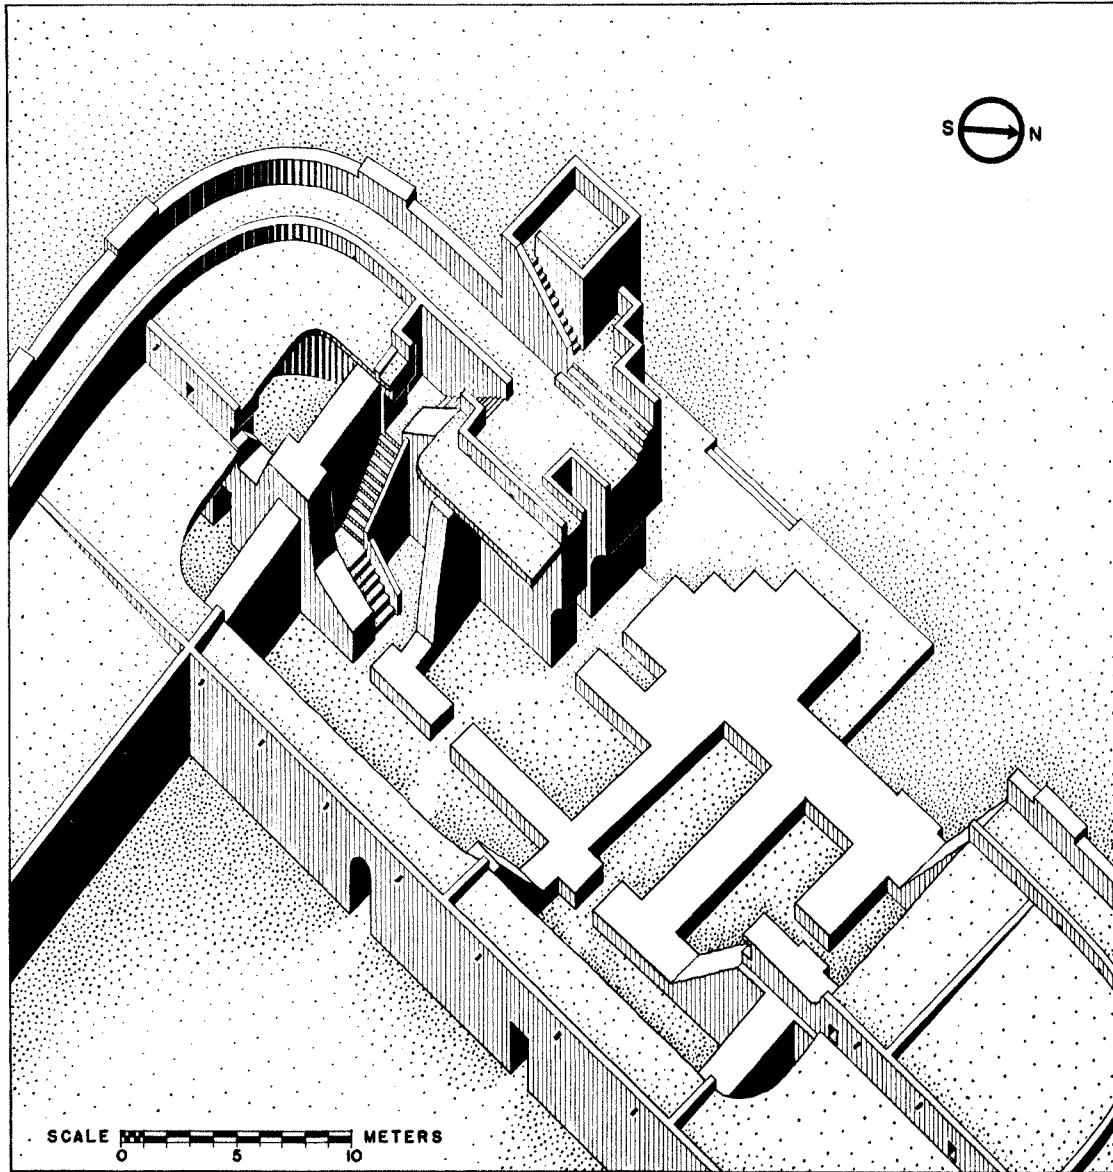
ISOMETRIC RECONSTRUCTION OF THE LATE GATEWAY (PARTLY CUT AWAY). SCALE, 1:320
